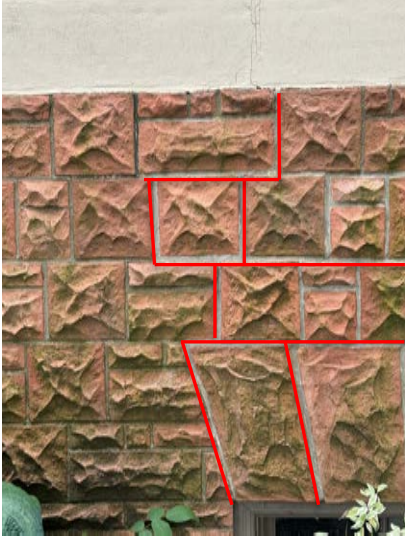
Step crack through mortar joints. Red lines show locations of open or cracked joints.
